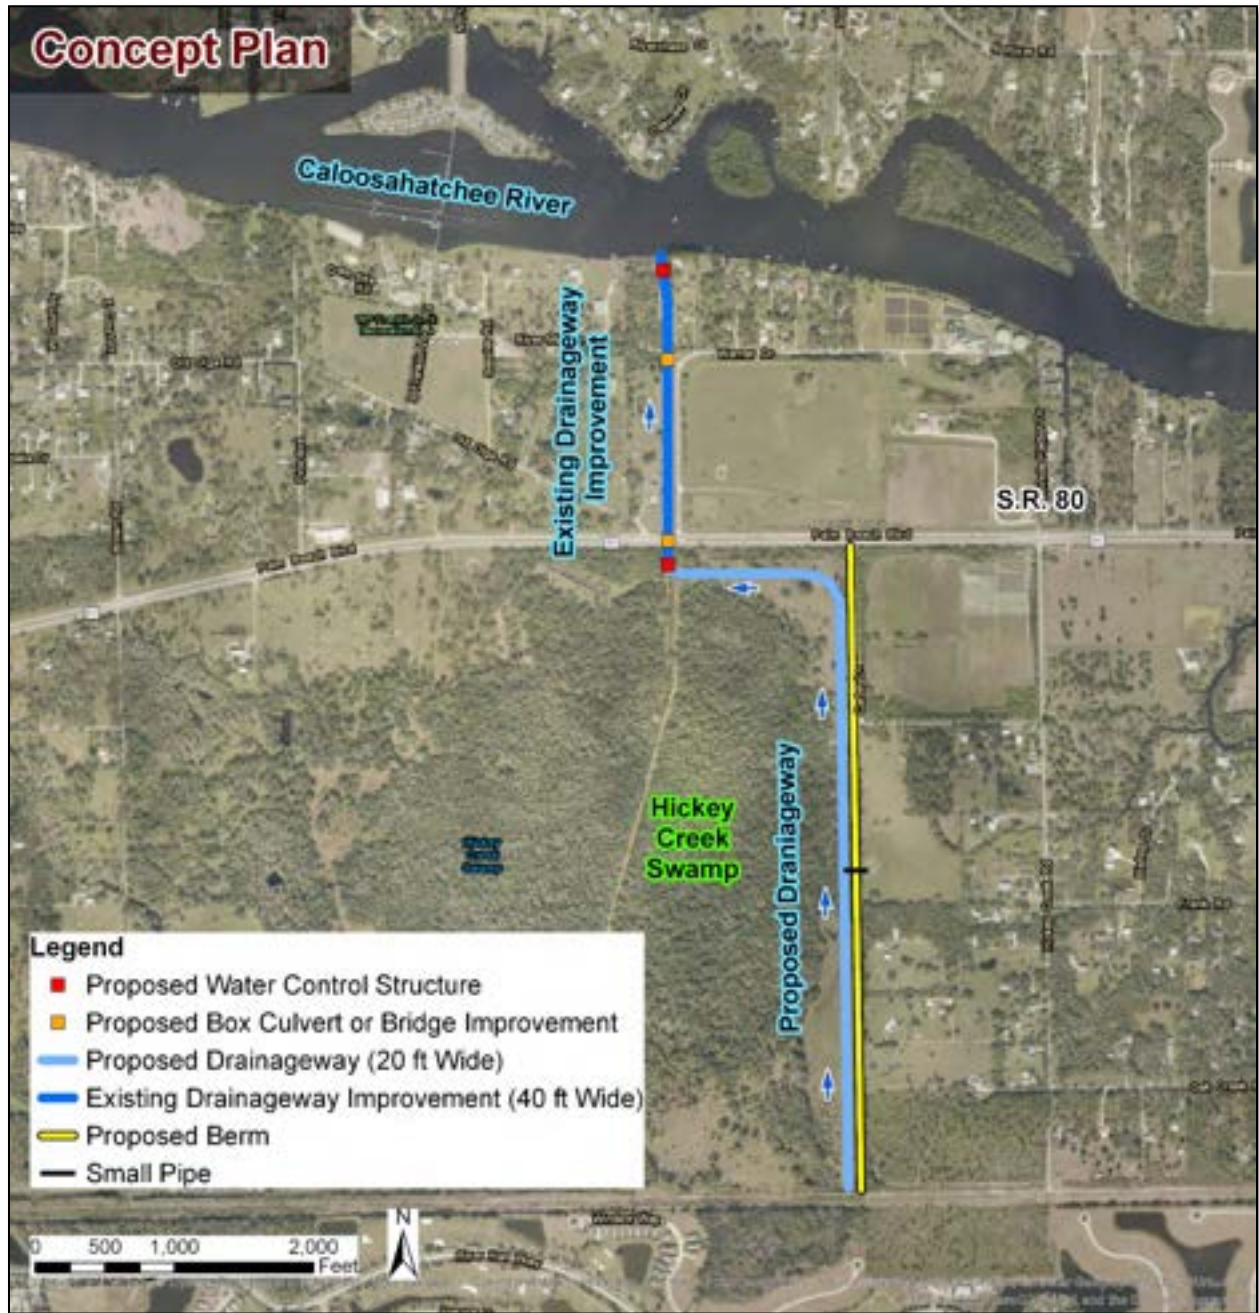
Concept Plan, 1.1.10 Hickey Creek Swamp Drainageway
